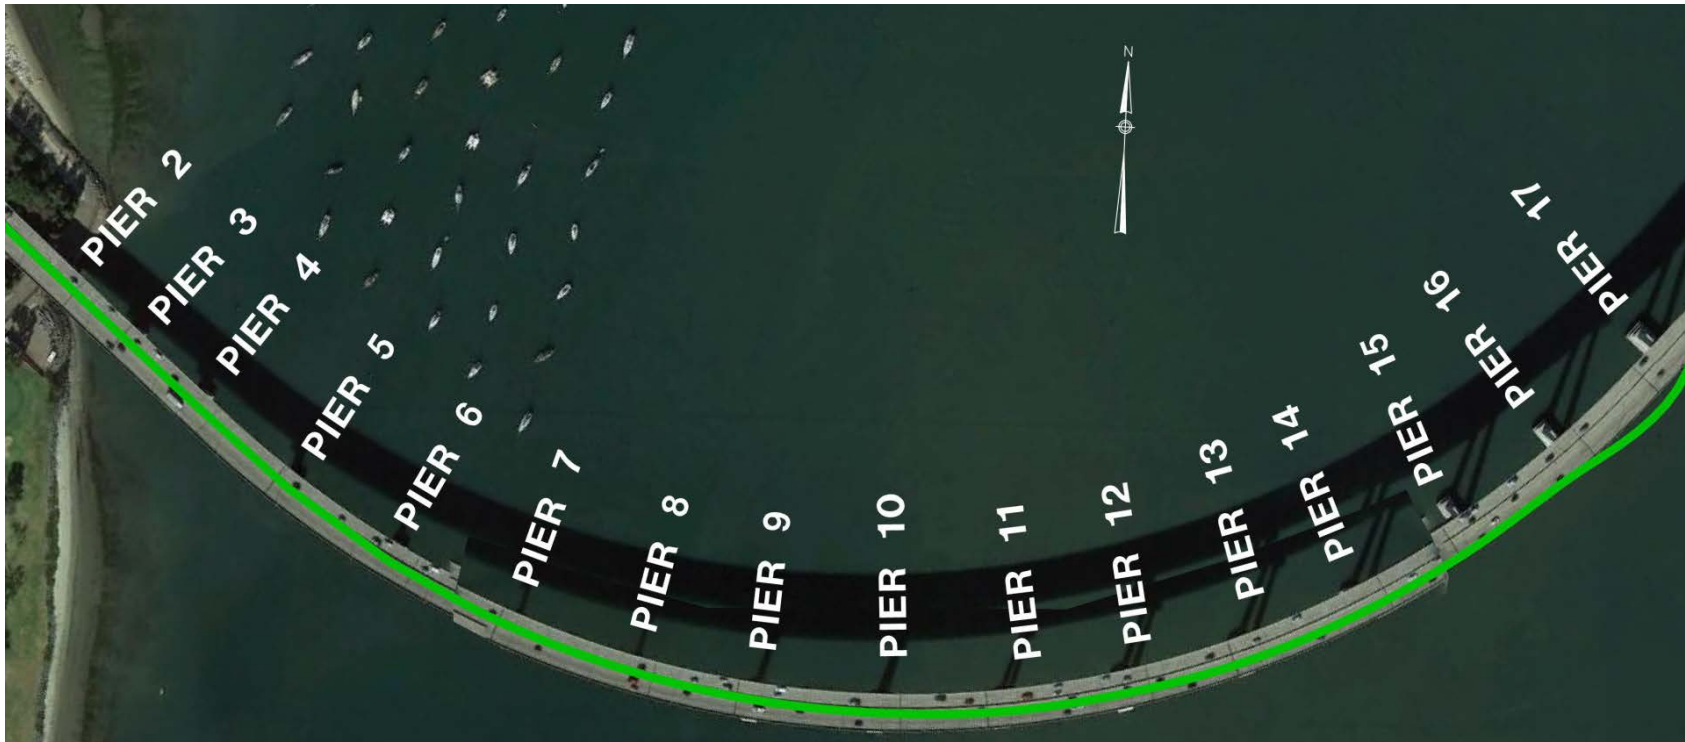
Proposed Concept (shown in green) Abutment 1 through Pier 17 – Western Extent to Mid-Span
